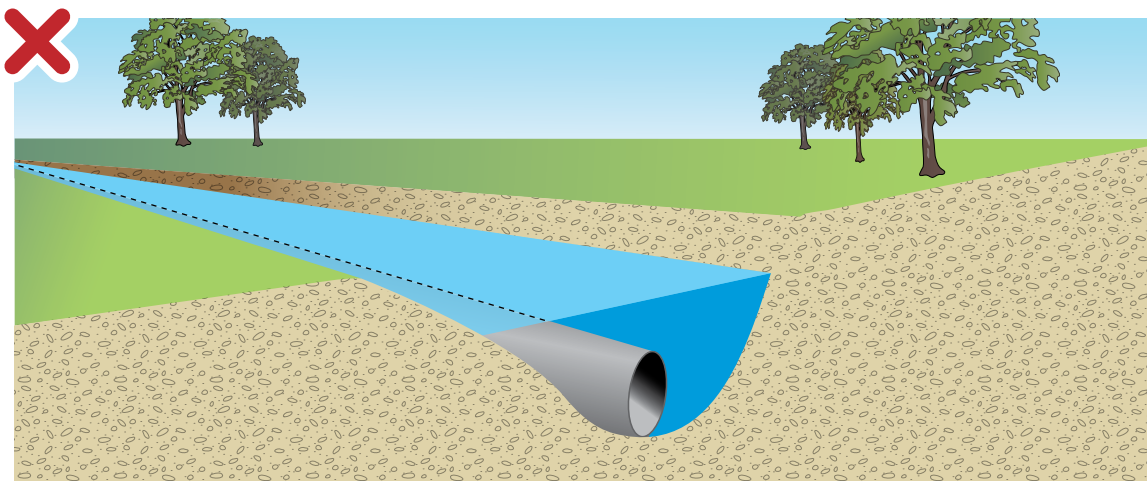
Poor practice, do not lay pipes or cables on the river bed or use rivers as conduits for pipes and cables.
